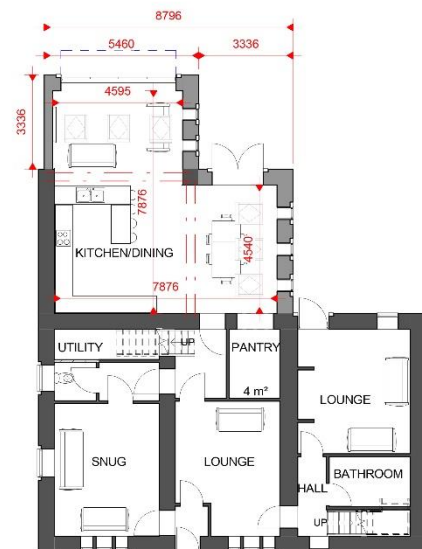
Proposed Floor Plan (Authors Own, 2020)
